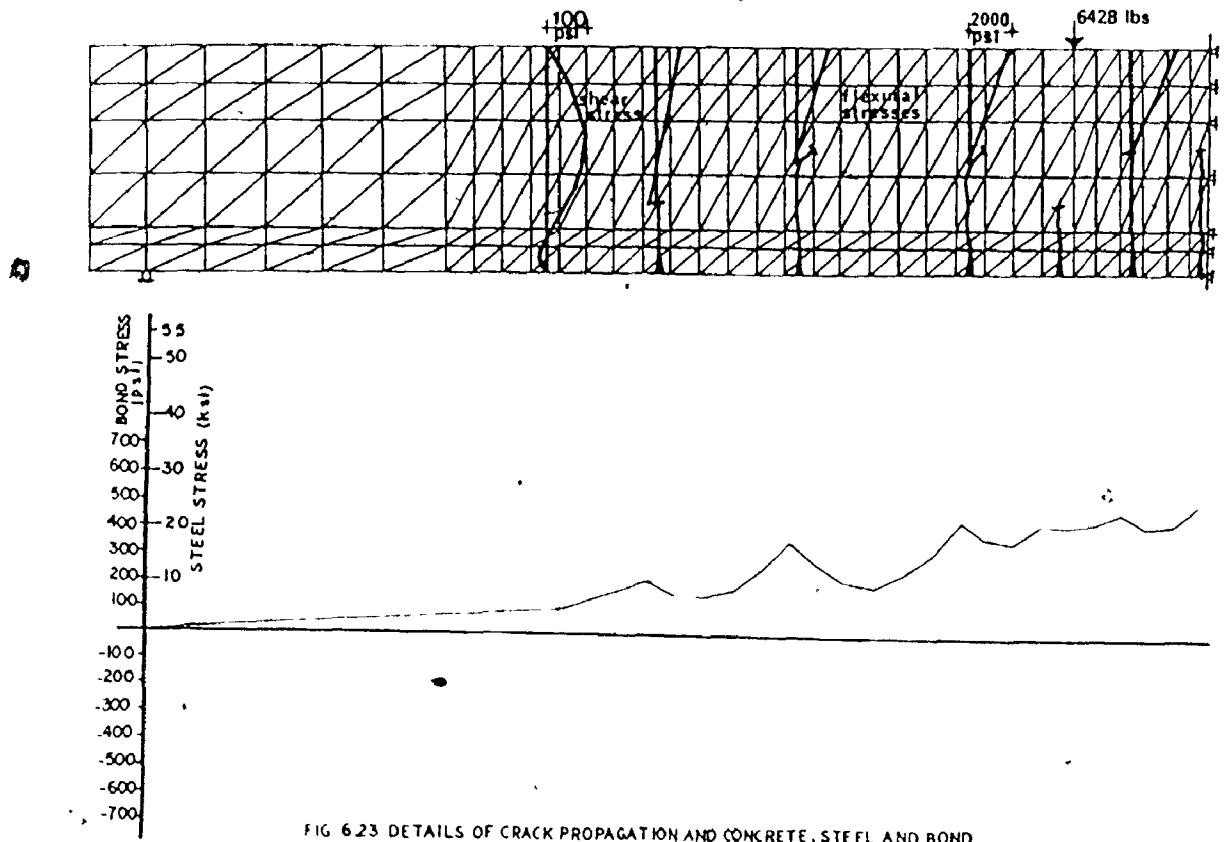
DETAILS OF CRACK PROPAGATION AND CONCRETE, STEEL AND BOND STRESS DISTRIBUTIONS FOR BEAM(7/1)
